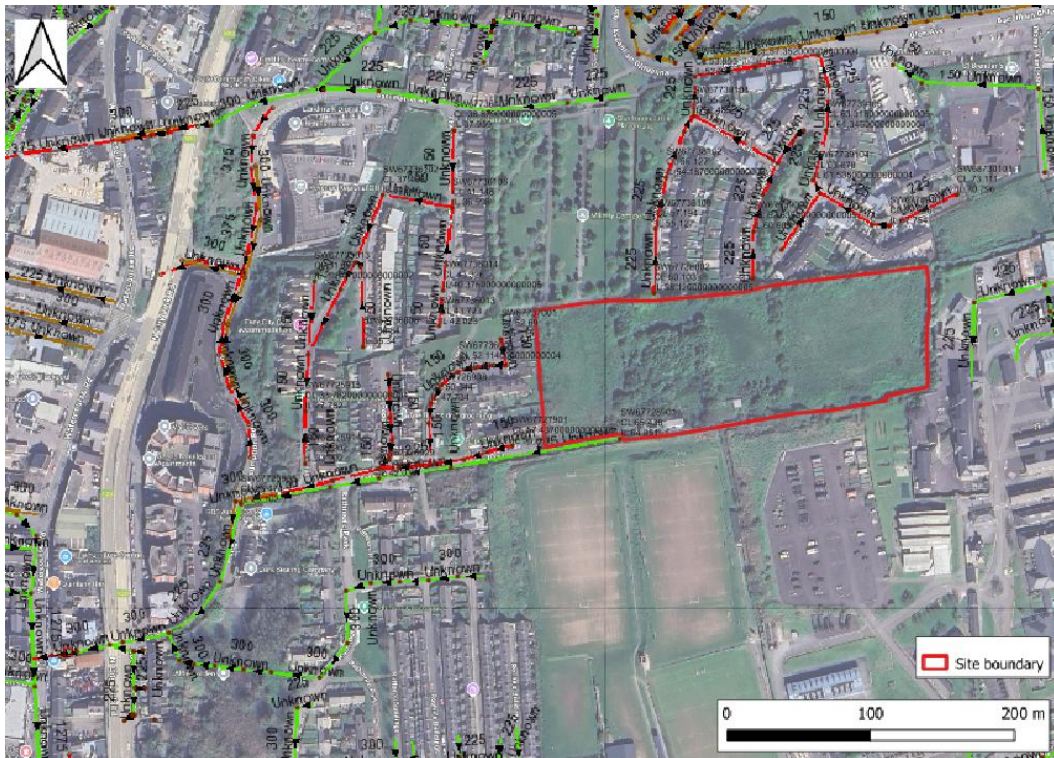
Existing foul drainage adjacent to site (extract from IW records, site boundary outlined in red)
